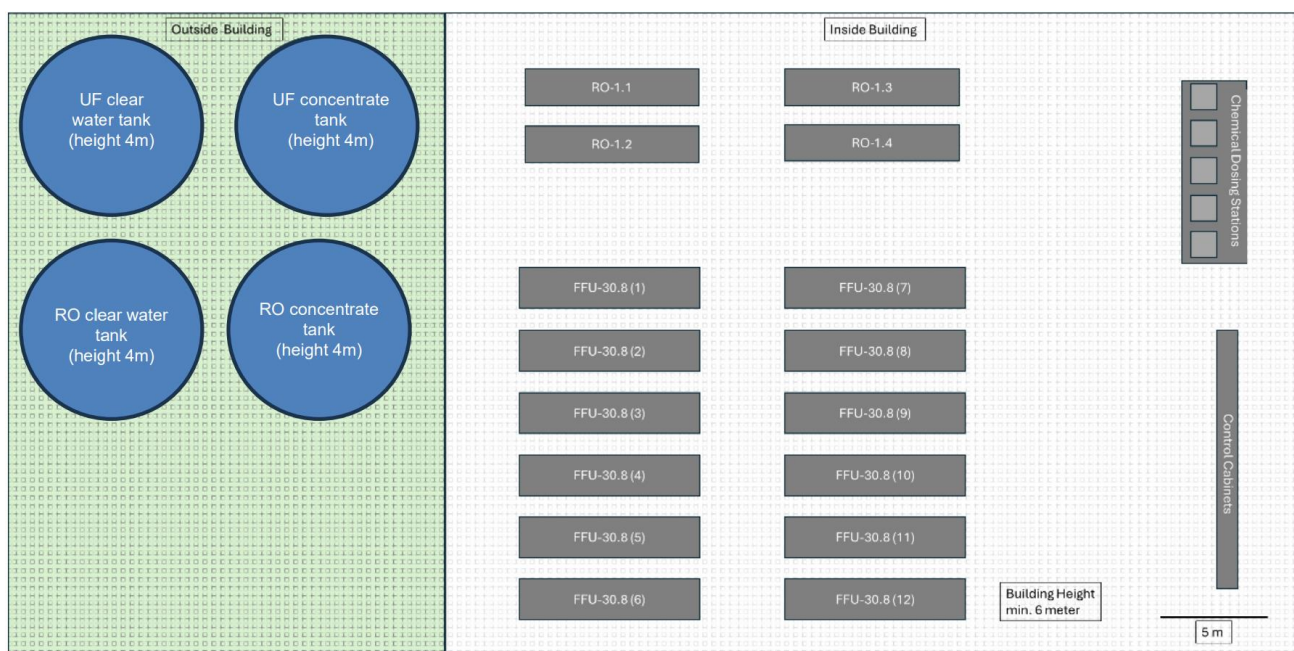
Basic lay-out drawing of a full-scale water treatment facility.
